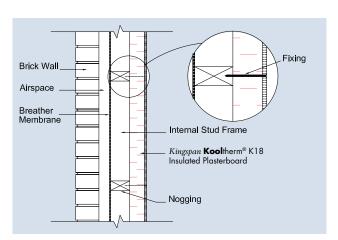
Side elevation - Brick veneer wall with Kingspan Kooliherm® K18 Insulated Plasterboard
